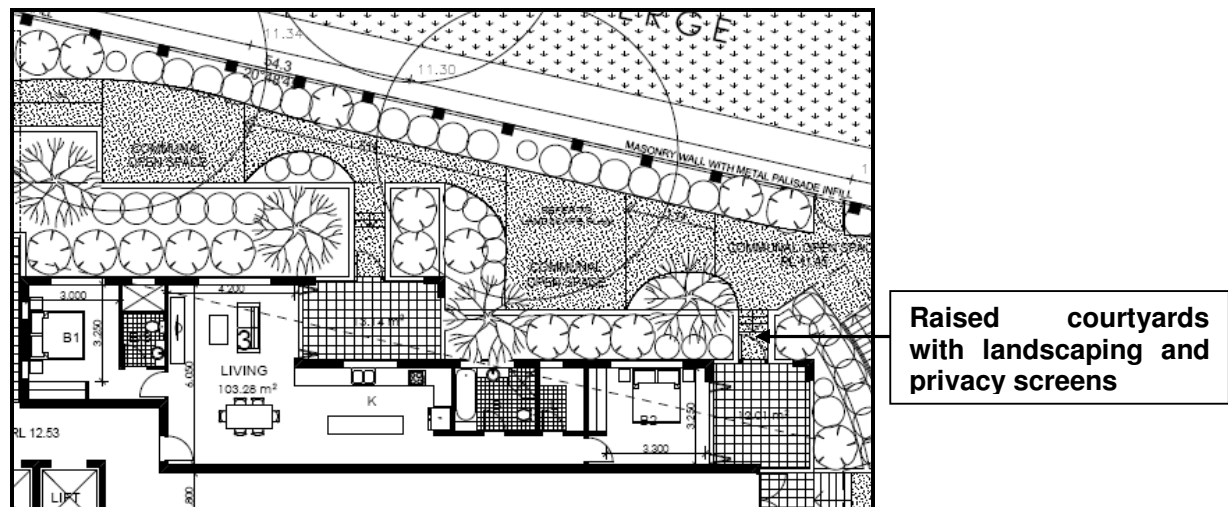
Extract of Ground floor plan (adjacent western boundary)
